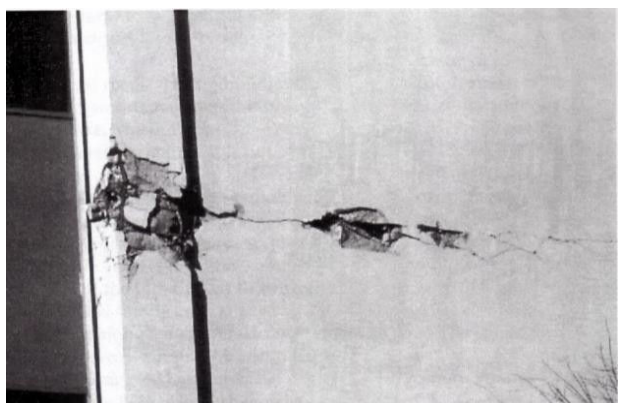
Example of damage to a reinforced concrete shear wall along a horizontal construction joint documented in the ATC-20 series [29]
